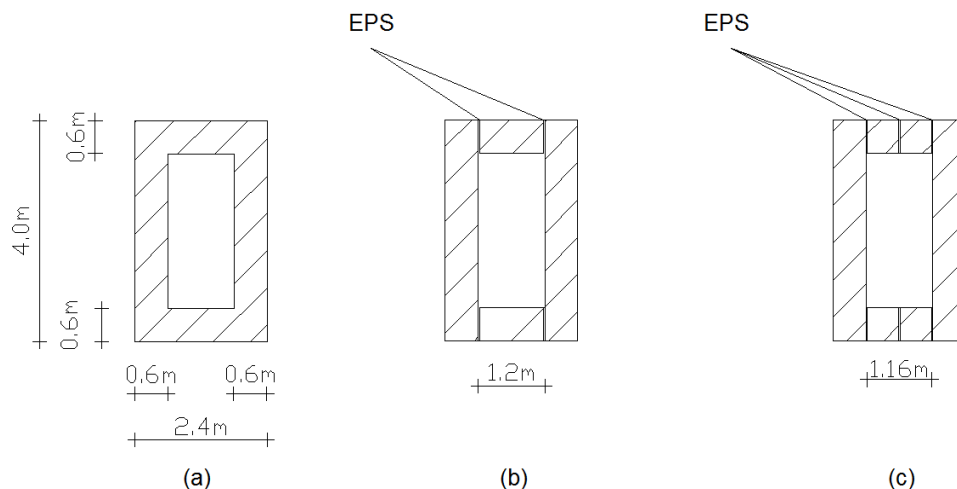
Cross section of the pier (a) for height greater than 20m (b) for height between 15 and 20m (c) for height smaller than 15m.
